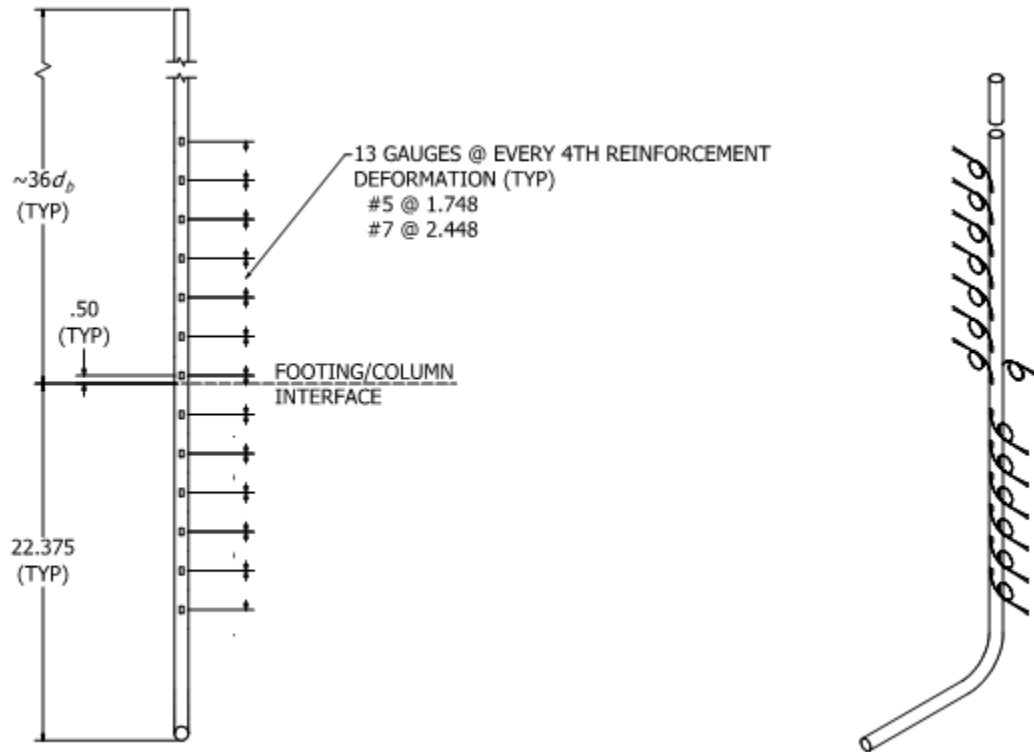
Strain Gauge Reinforcement Layout (Dimensions in Inches)
